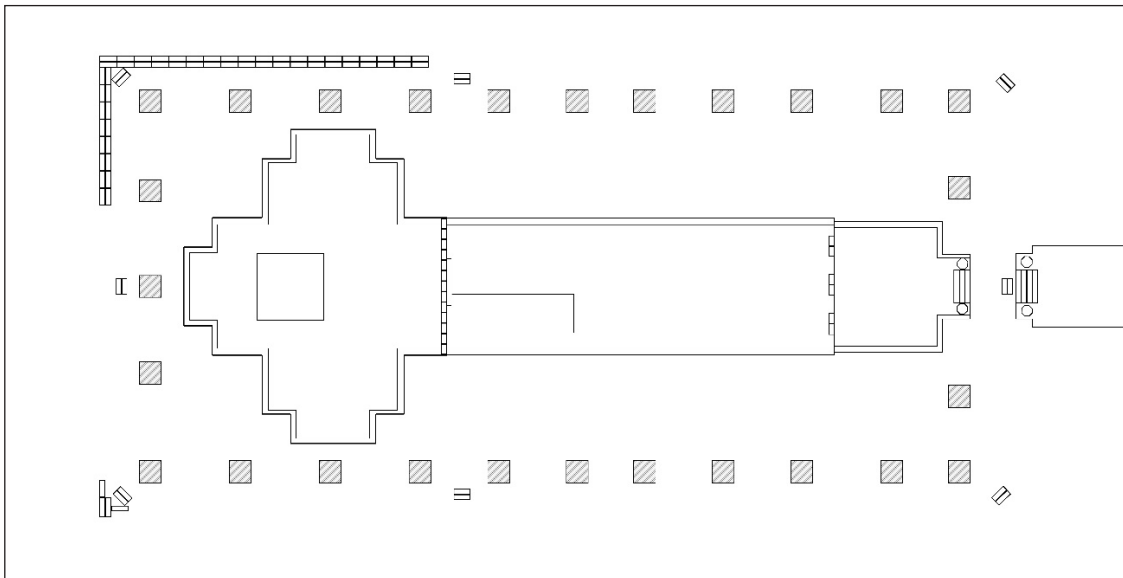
Scaled site plan of Tep Pranam Buddhist Terrace illustrating above-ground structural elements.
